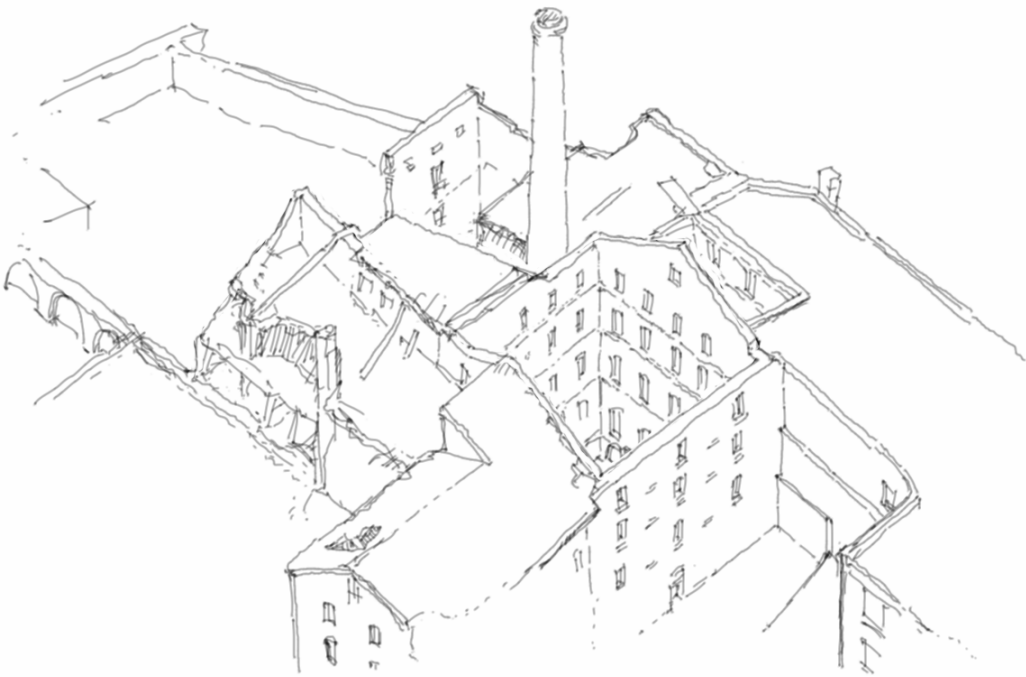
Building shell. Drawing analysis of bird's eye view looking north.
